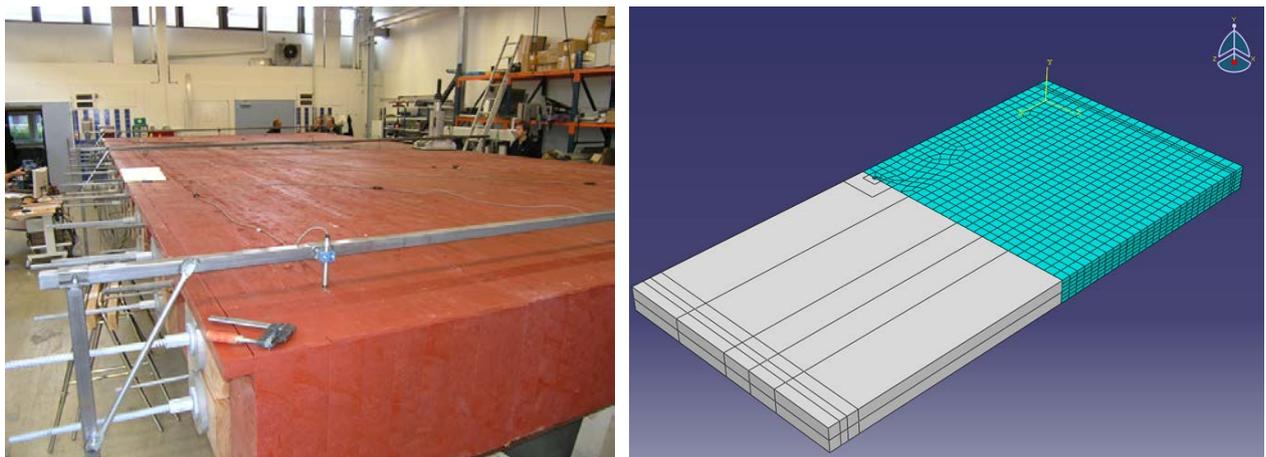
Left: bridge deck in laboratory test situation. Right: FE model
